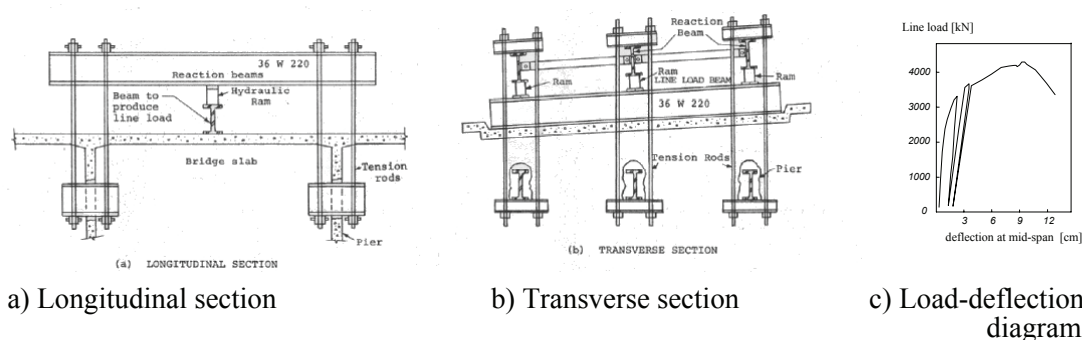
Flexural failure of bridge deck under line load (adapted from Jorgenson, Larson 1976)
